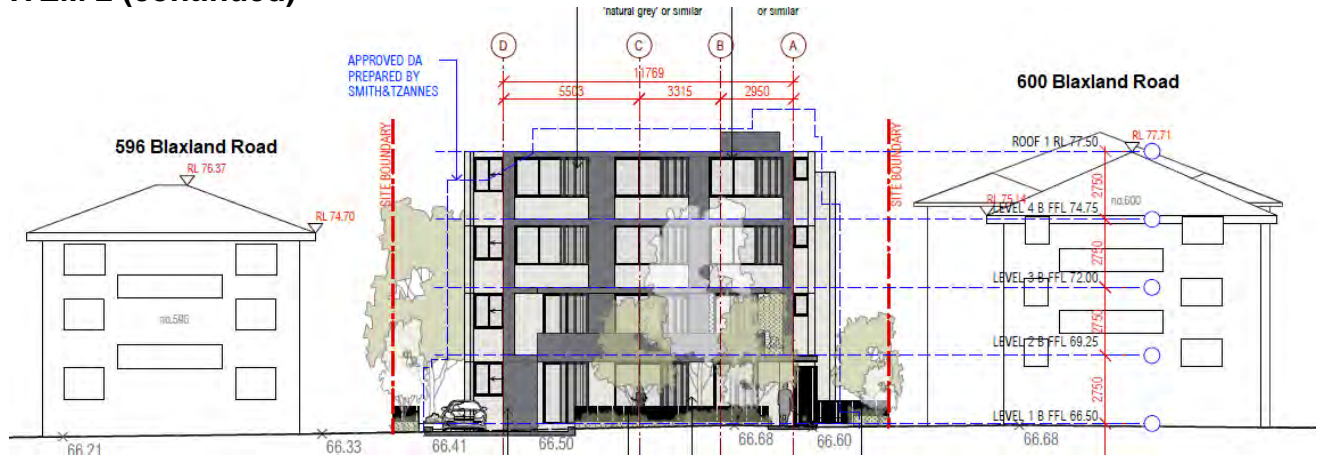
Street view of the proposed building and the adjoining residential apartment buildings on either side.
